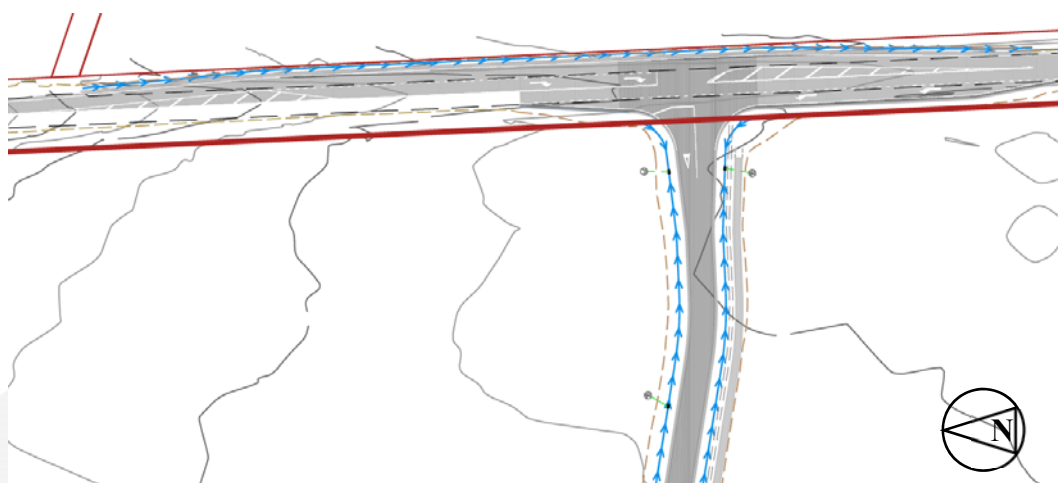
Overview of Proposed Arrowtown – Lake Hayes Road / New Waterfall Park Resort Zone Access Intersection (Extract from Paterson Pitts Drawing ‘Proposed Access Road Intersection Detail’, Q6388-15 Sheet 3 Rev B)
